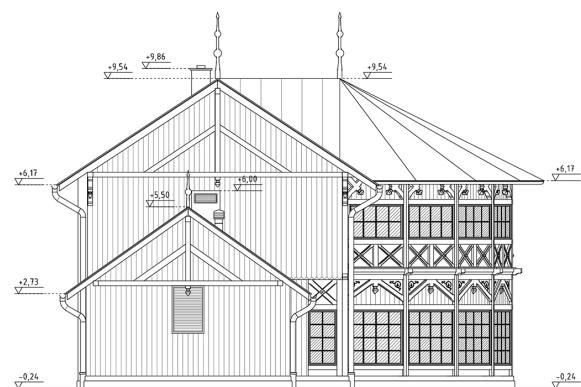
Eastern elevation of the shooting pavilion (Source: PKZ ARKONA Sp. z o. o.)
